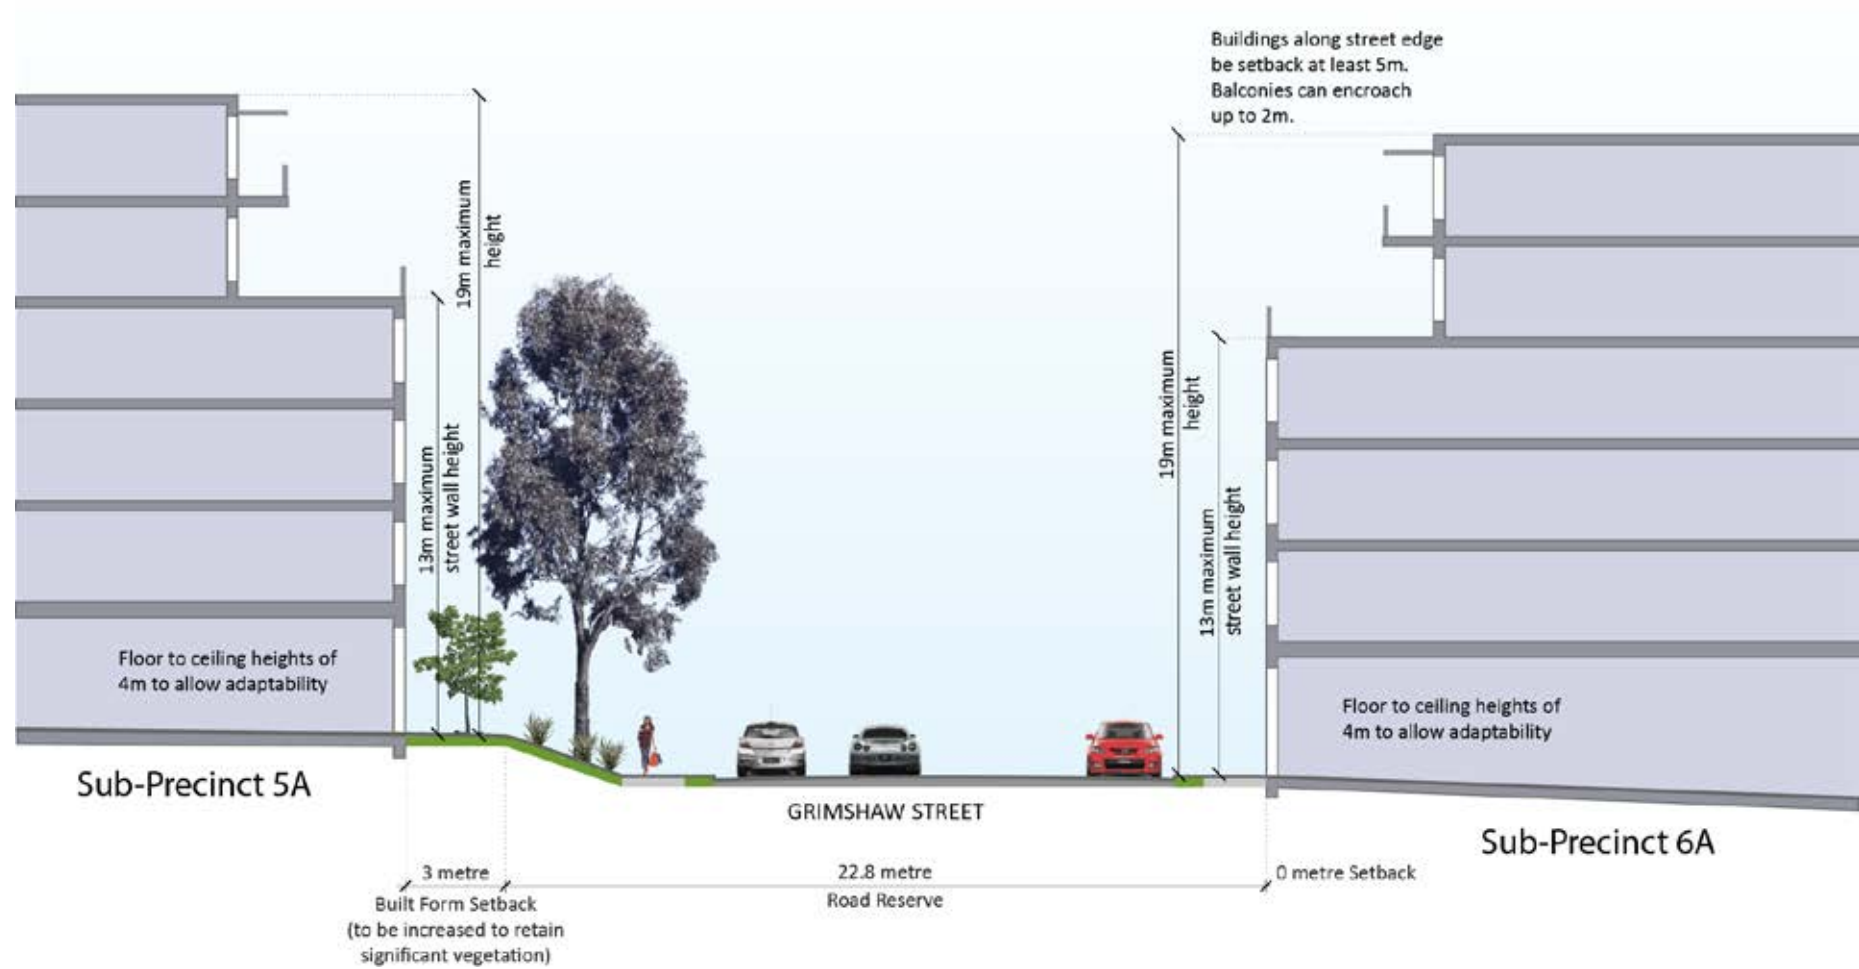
Section detailing heights and setbacks to Grimshaw Street from Precinct 5
